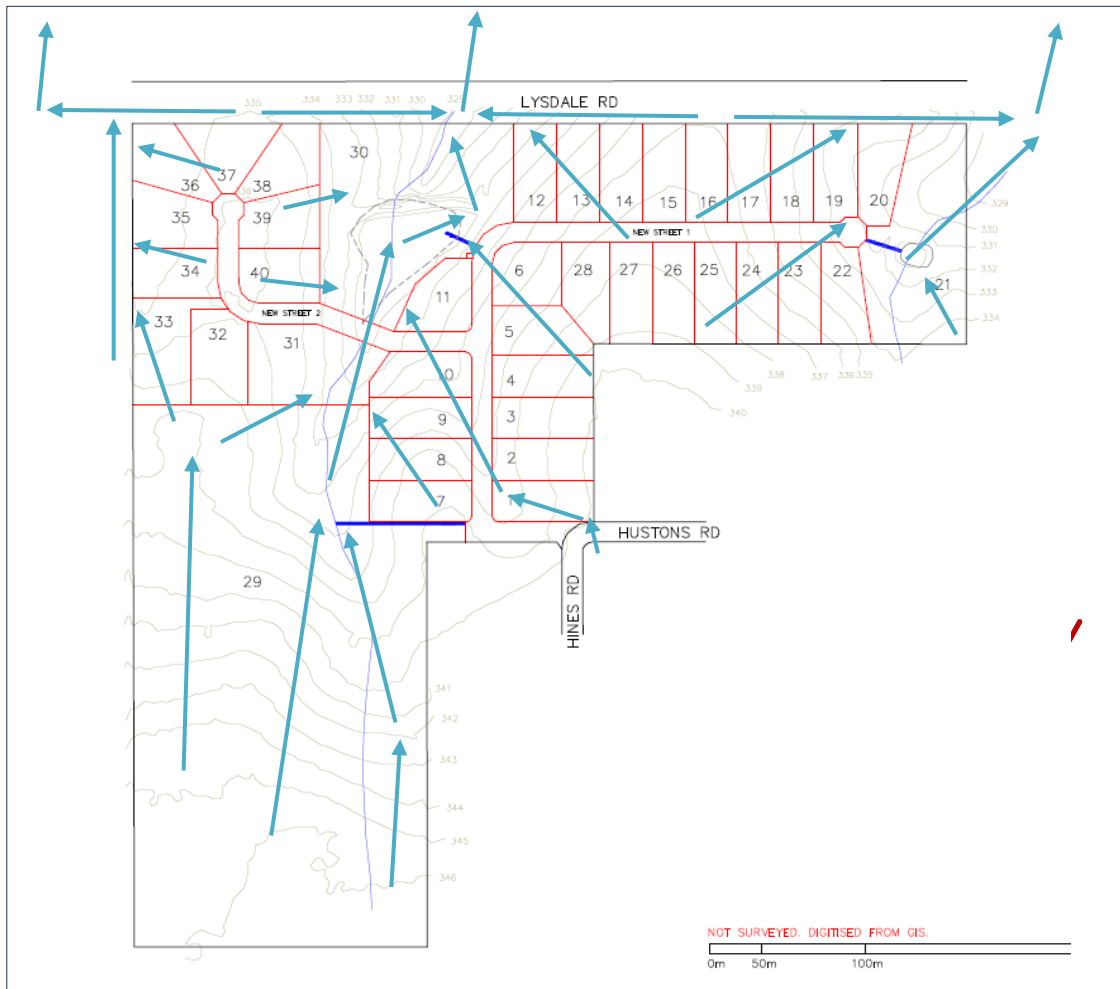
Lot Pre-Development Catchment Plan - Existing Site Features and Stormwater Drainage
